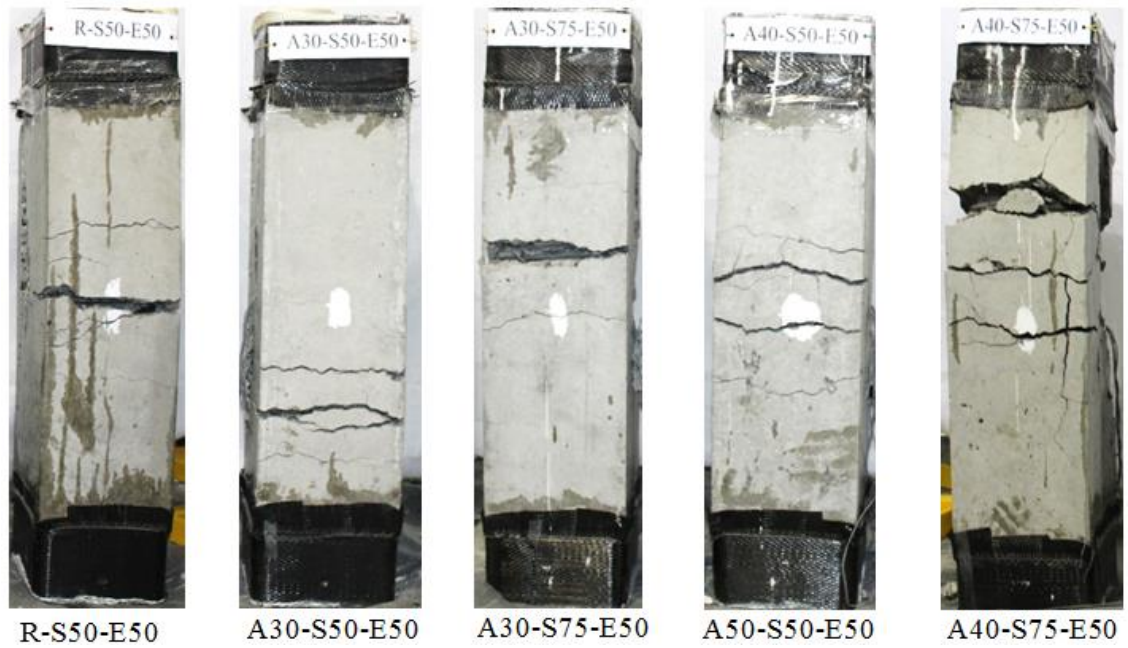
Behaviour of Specimens under 50 mm eccentric axial loads: Tension side
